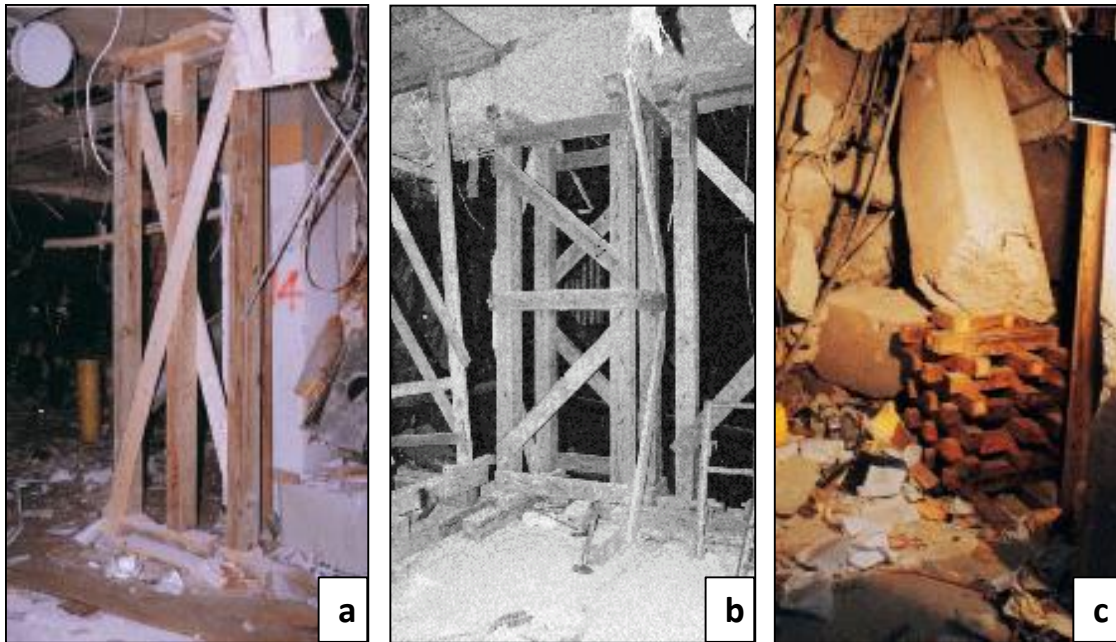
Shoring at the Murrah Building in OKC (a) Vertical shore (b) Laced post shore (c) Three tier crib shore [Source: O’Connell 18]
